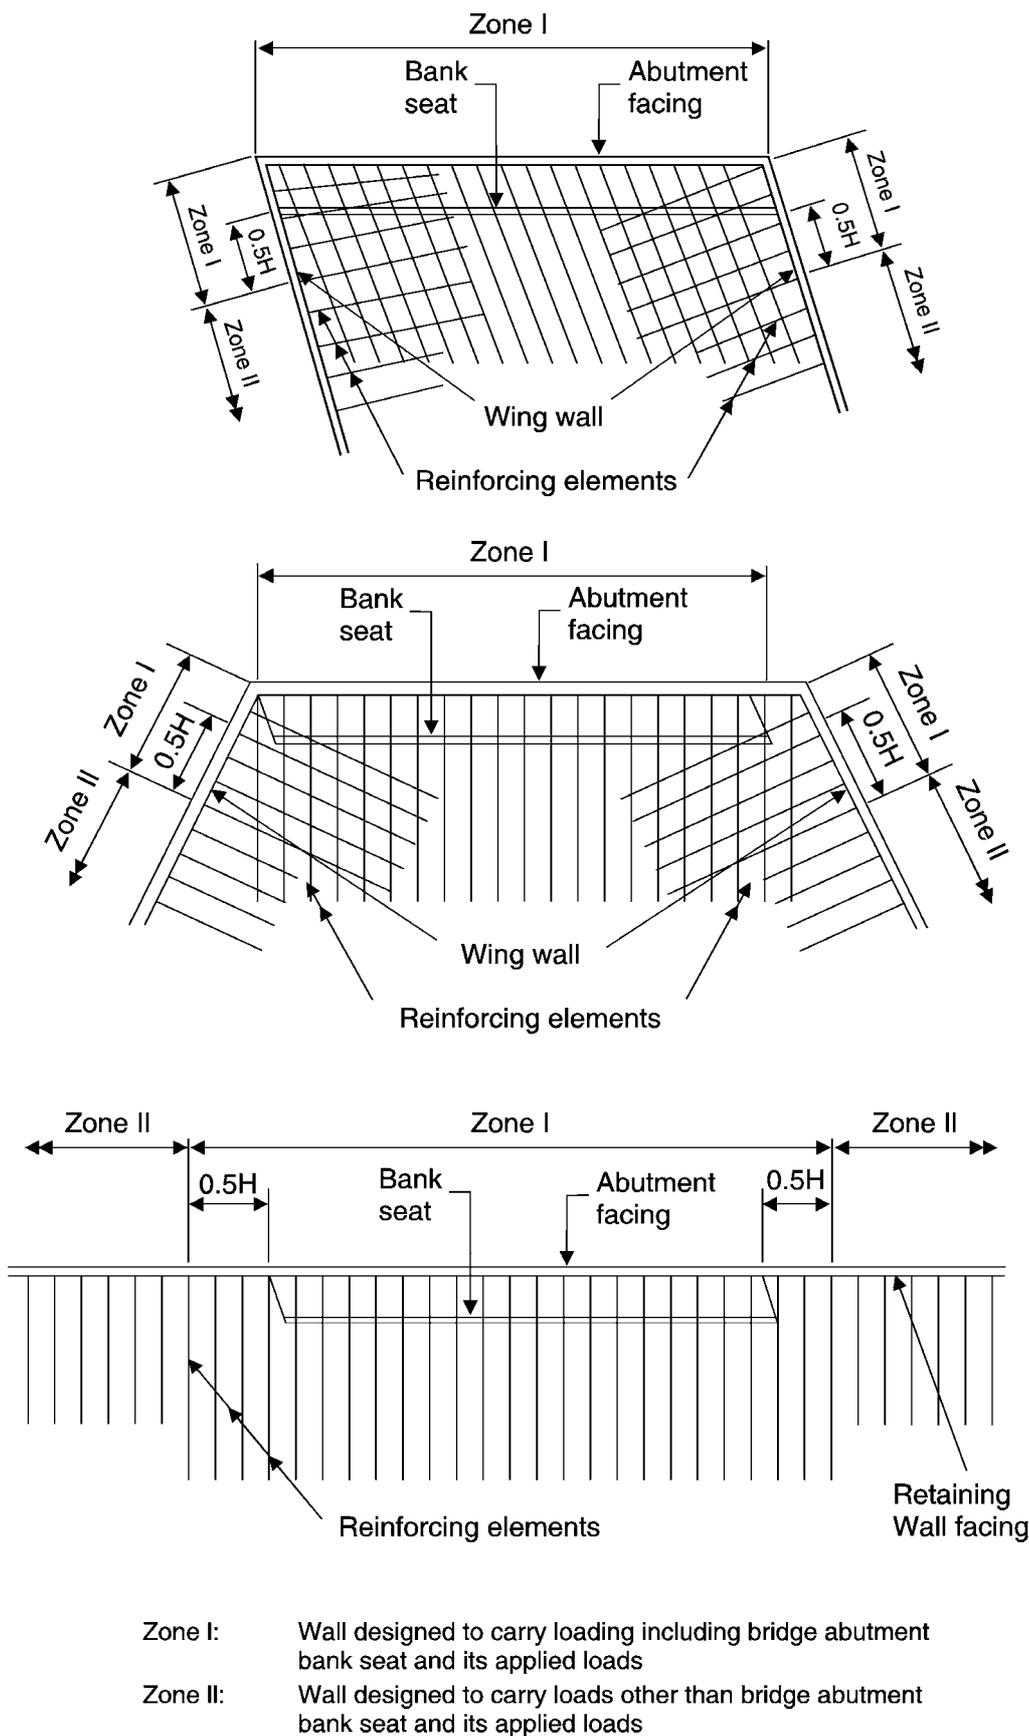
A: Bridge abutments: Typical layout plans for strengthening elements
